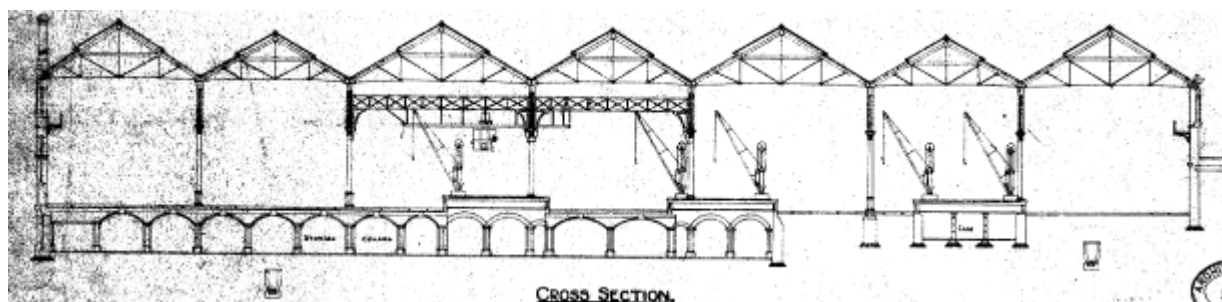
West facing cross section of the ground floor of the Goods Station, showing platforms and cranes beside the main lines, used for lowering goods to the undercroft below through the trapdoors in the platforms
